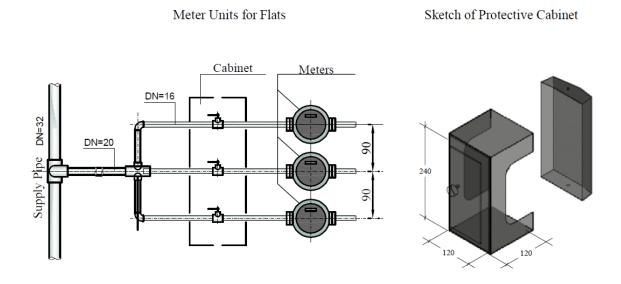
Scheme of shut-off valve and meter installation in entrances on each floor
